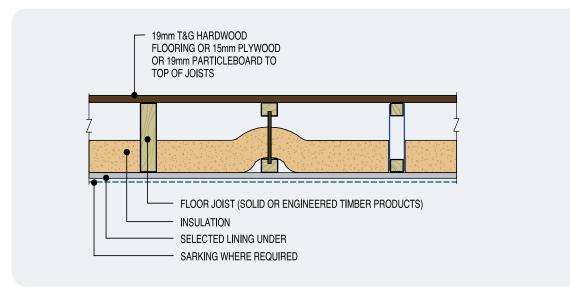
19 mm T&G Hardwood flooring or particleboard to top of joists
